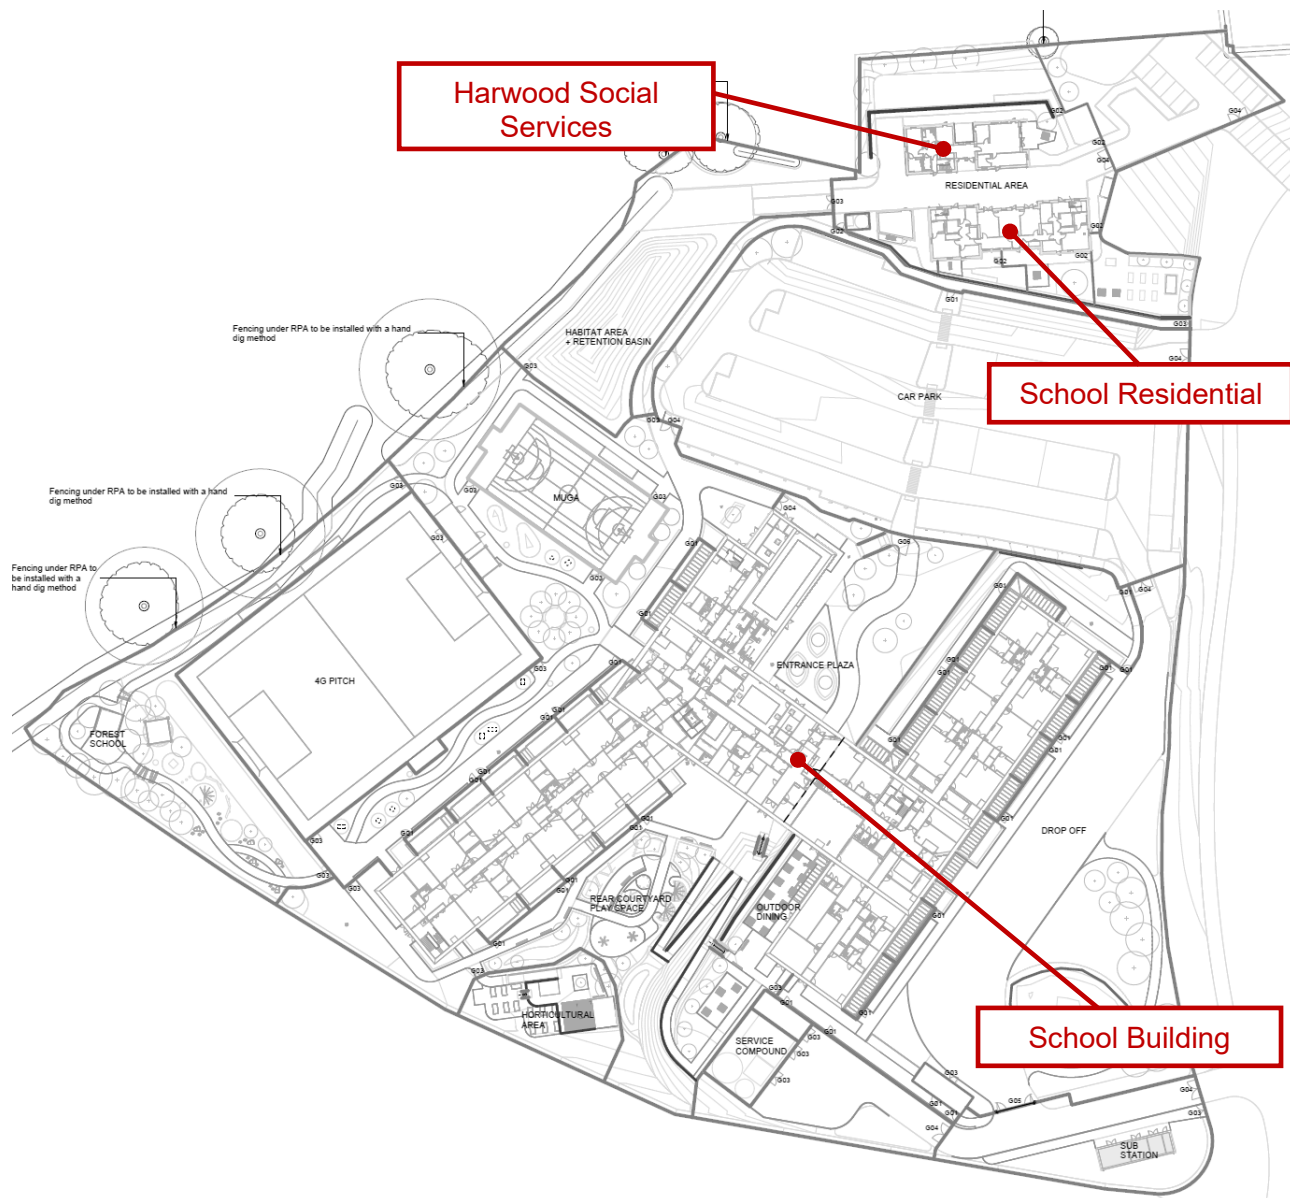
SITE PLAN SHOWING PROPOSED RESIDENTIAL BLOCKS AND SCHOOL
